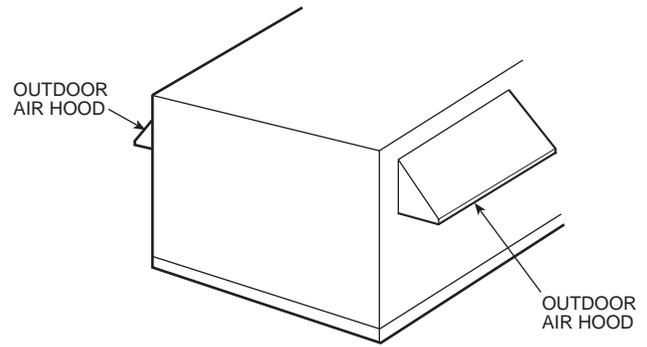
Outdoor Air Hood Installation (Sizes 030-050)
